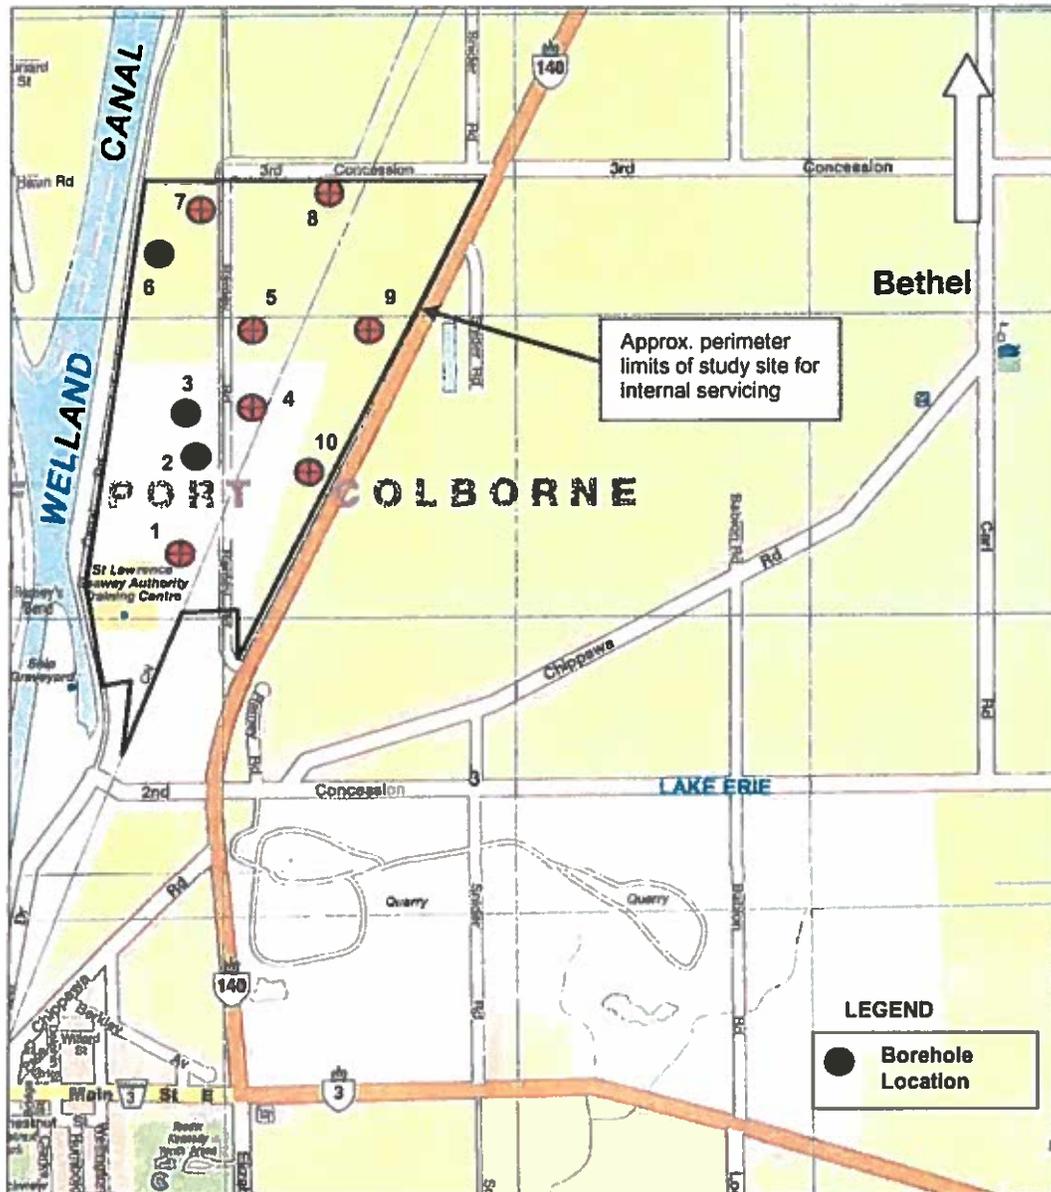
Key Location Plan of Subject Site and Borehole Locations
